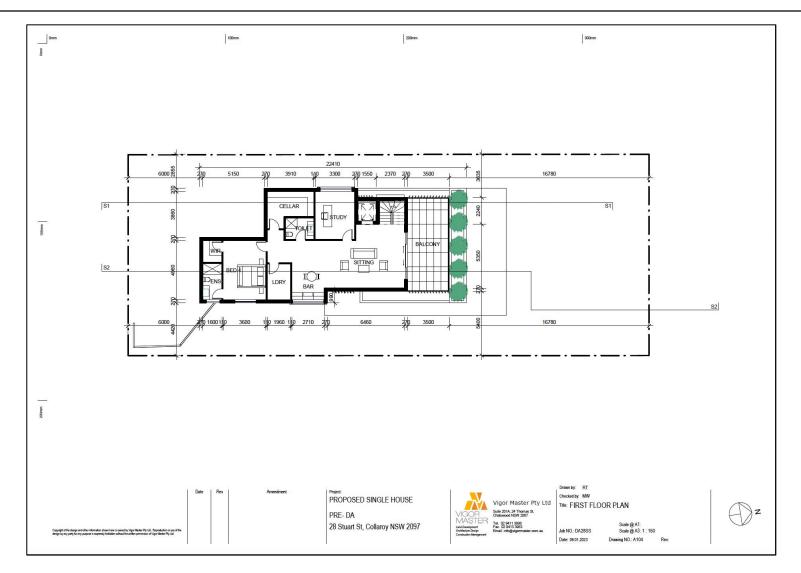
ILLUSTRATES PROPOSED FIRST FLOOR PLAN
